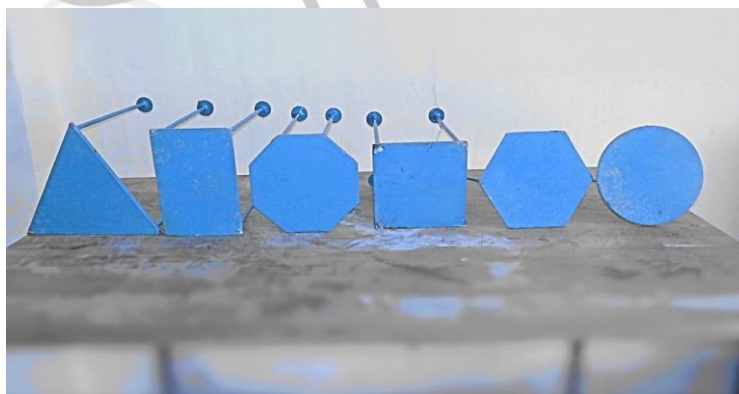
ACTUAL PHOTOGRAPH OF FOOTING SPECIMENS
